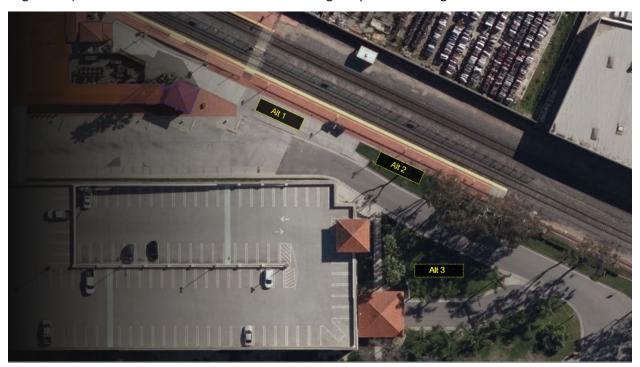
Potential Alternative (alt) Locations for Battery Siting
